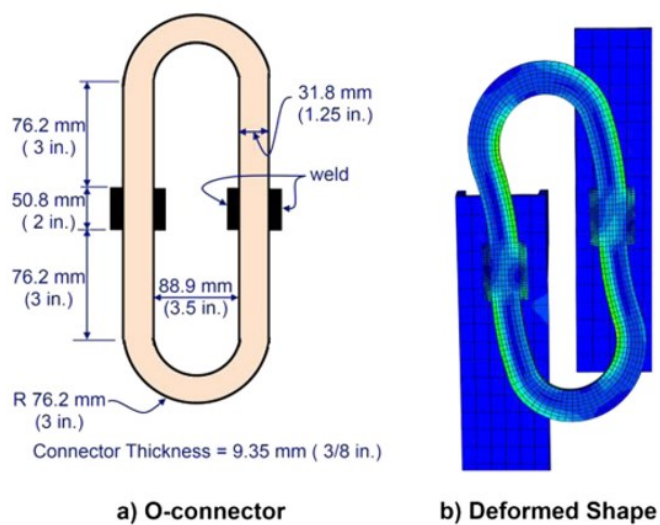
the geometric view of the O-connector and its deformed shape [31]
